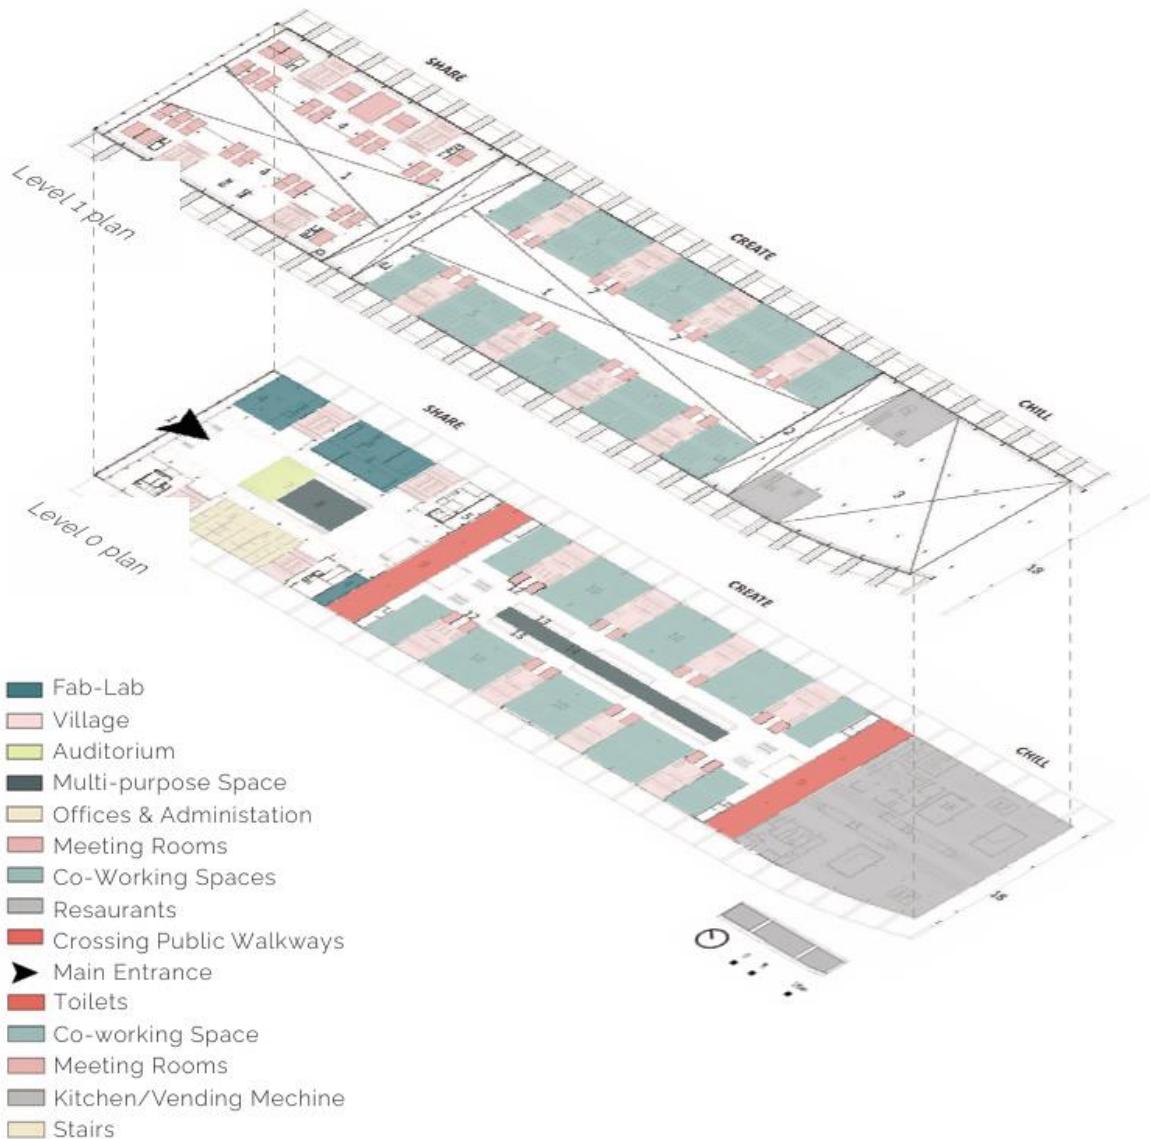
Station F - Building Composition Plan (ArchDaily)
